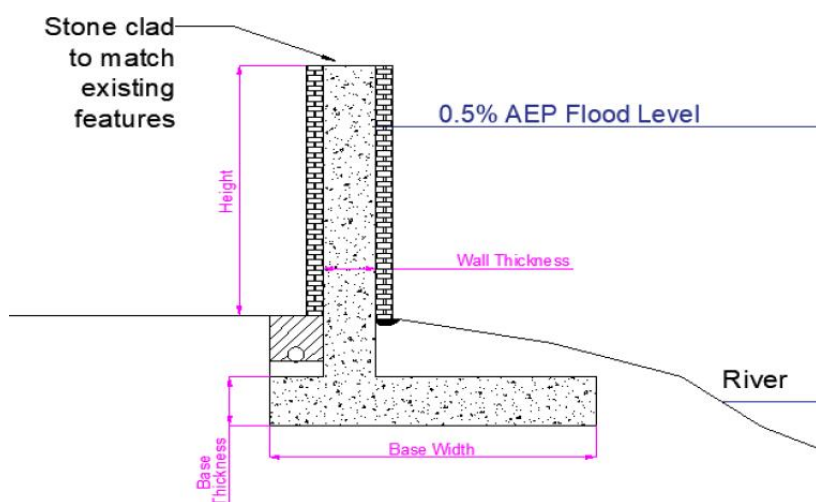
Precast Reinforced ‘L’ Shaped Flood Wall
